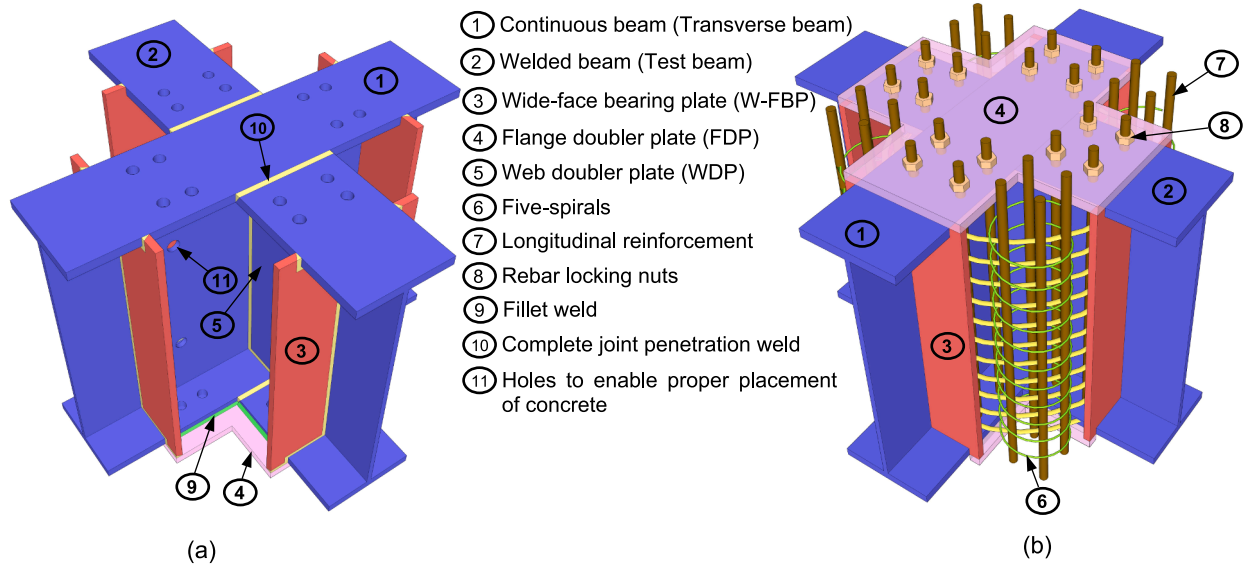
Proposed joint design: a) steel framing of the joint with weld details before the attachment of flange doubler plate (FDP), and b) proposed joint.
